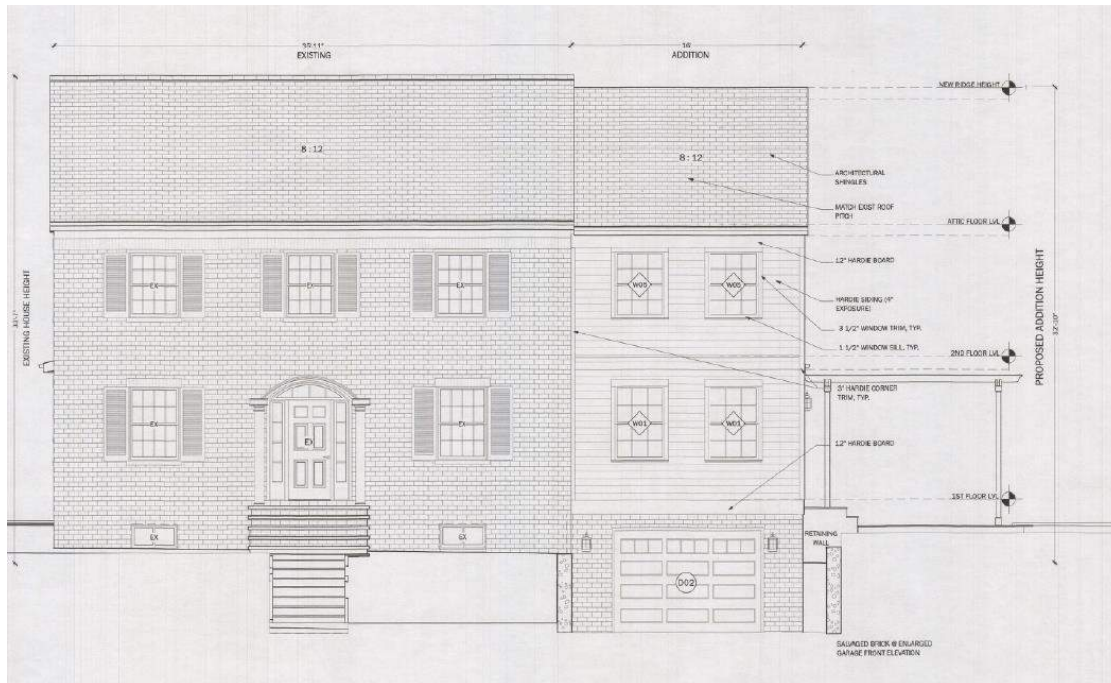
Approved front elevation, showing proposed driveway, retaining walls, and grading.
